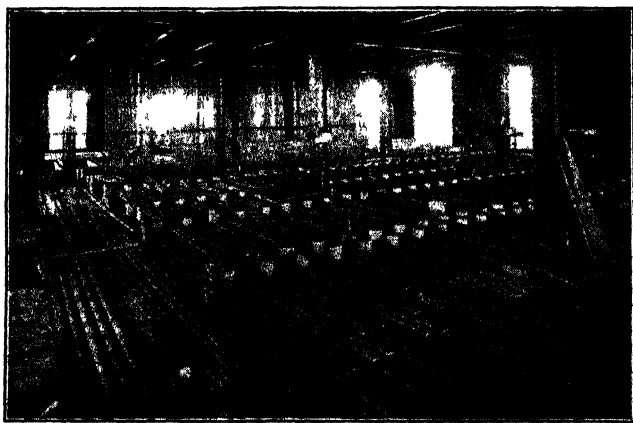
Essex Station, Public Service Corporation of New Jersey. Conduits in main floor of switch-house.
